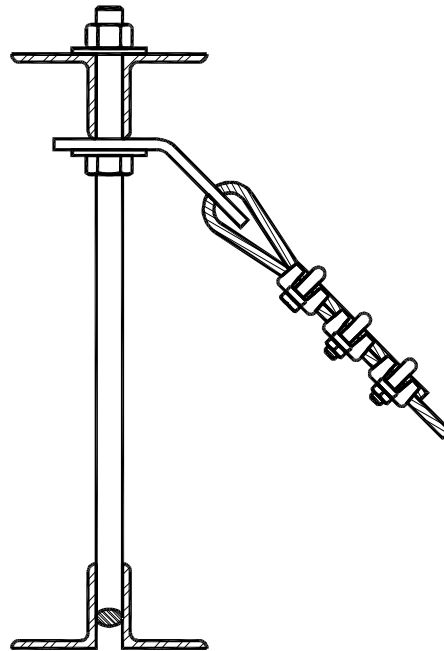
; Attaching KSUA Brackets to Un-Braced Open Web Steel Joists
